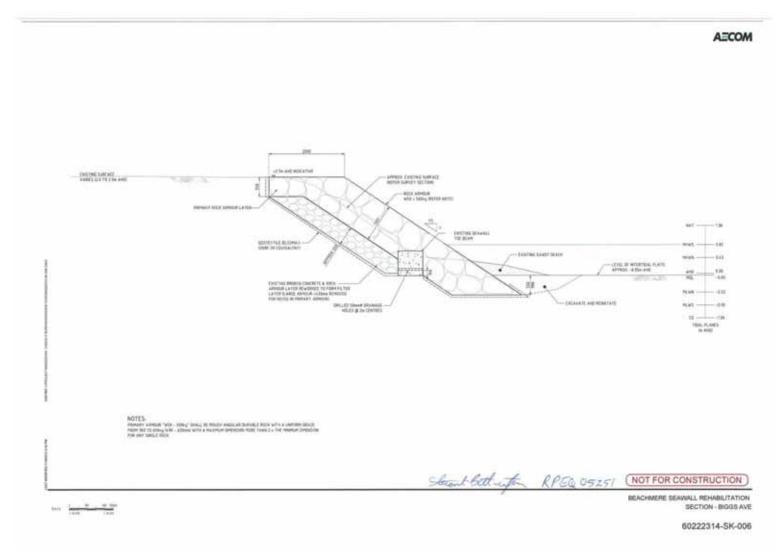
Biggs Avenue Proposed Seawall Upgrade Cross Section
